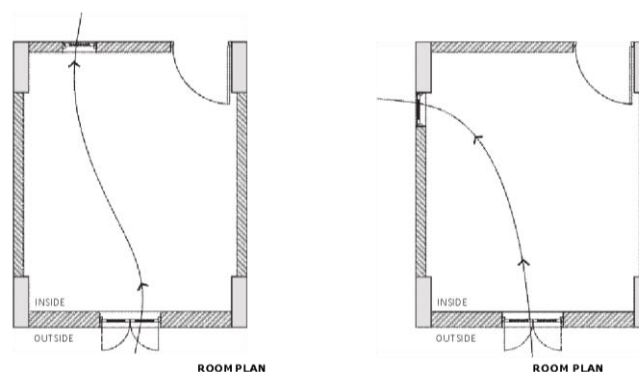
Openings on adjacent or opposite external walls for cross ventilation (Guideline)
